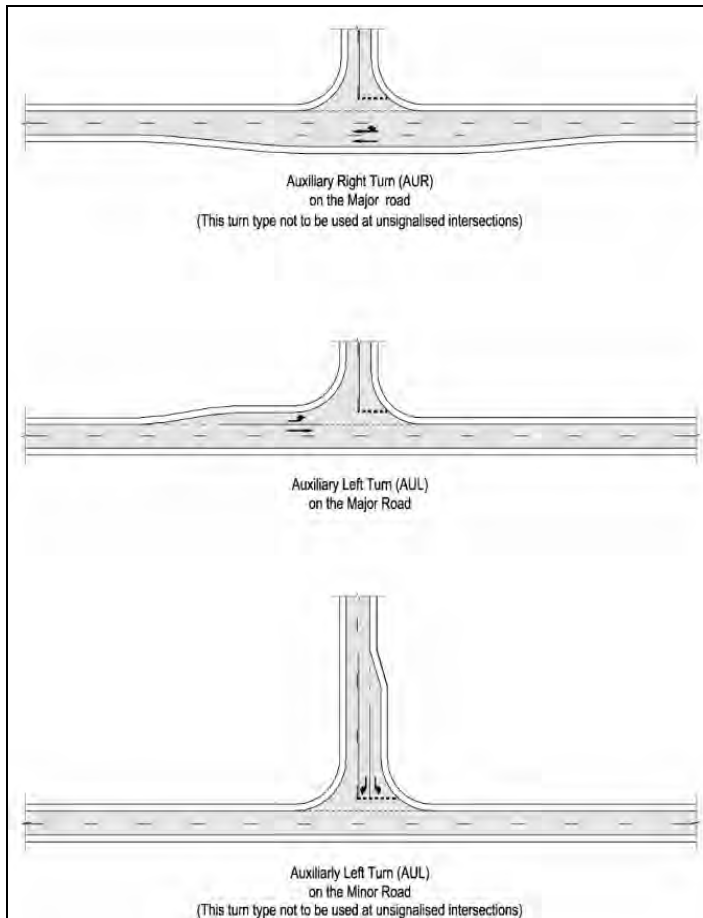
Recommended DTMR AUR and AUL Turn Treatment Layout
